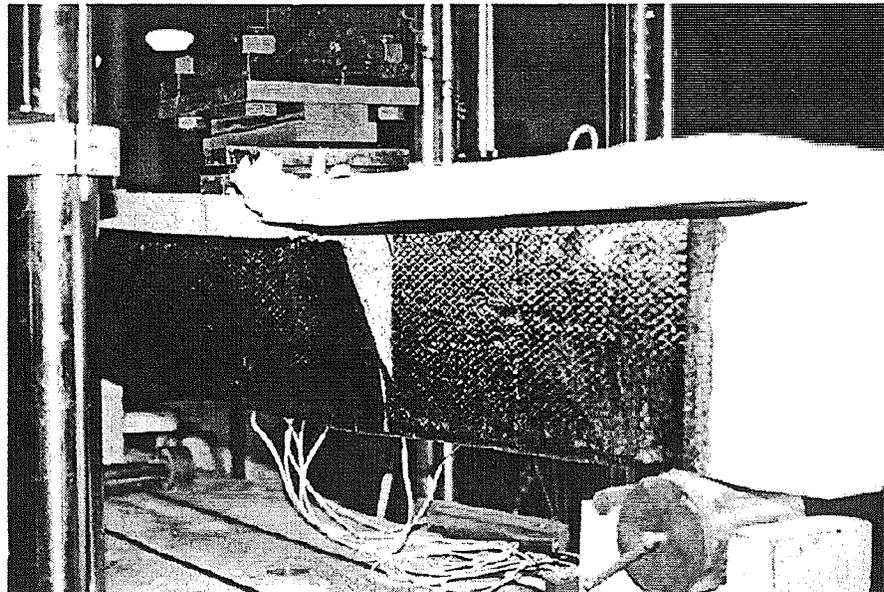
Shear-failure after delamination of CFRP sheet in Beam No. 5
